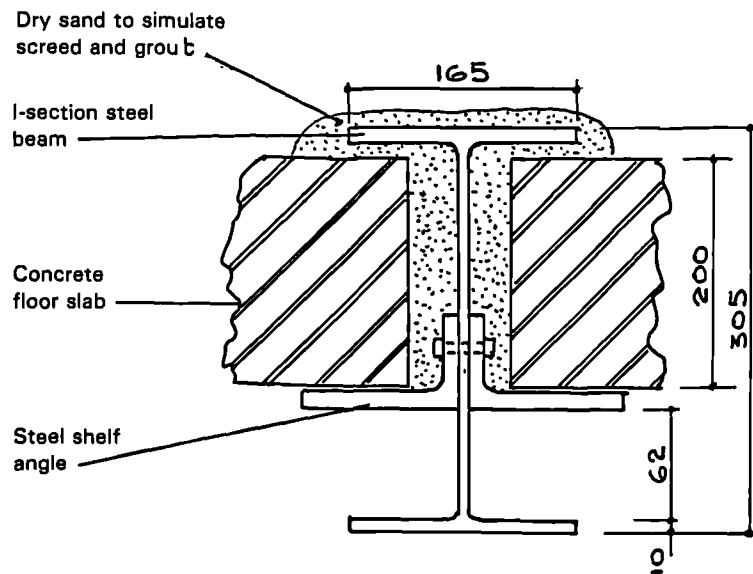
Section through 305 mm deep shelf angle floor beam
